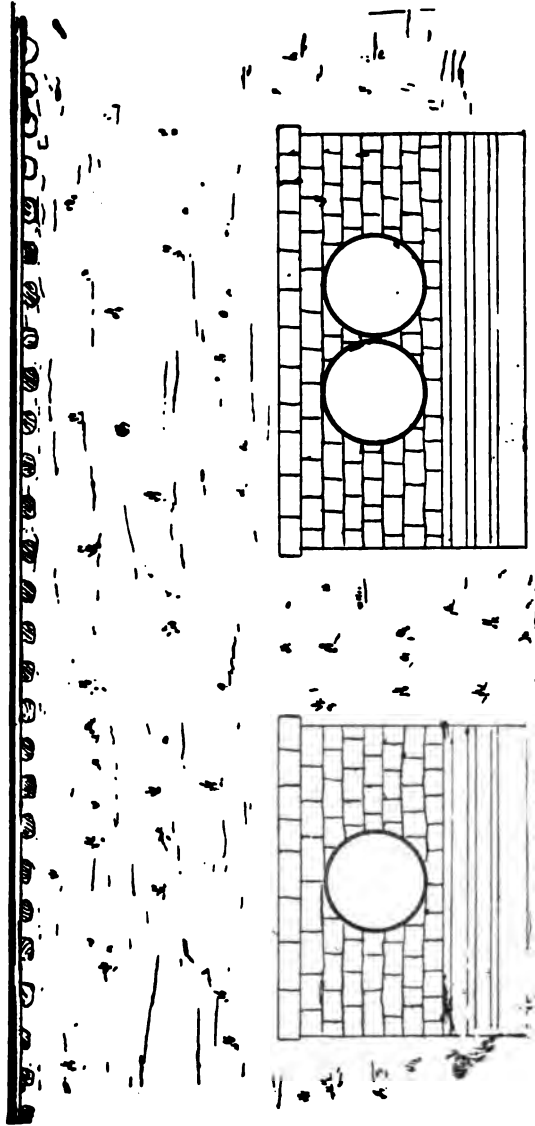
POSITION OF PIPE FOR WATERWAYS UNDER RAILROAD EMBANKMENTS.
